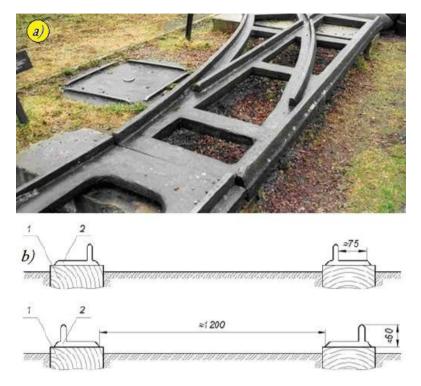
Angular shaped cast iron rails: a) Mockup, b) Scheme, 1 – Rail support; 2 - cast iron plate
